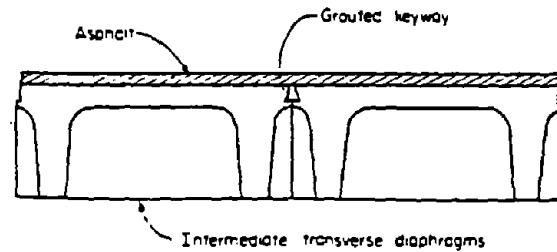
Precast Channel Slab Bridge (Winter and Nilson 1979)
